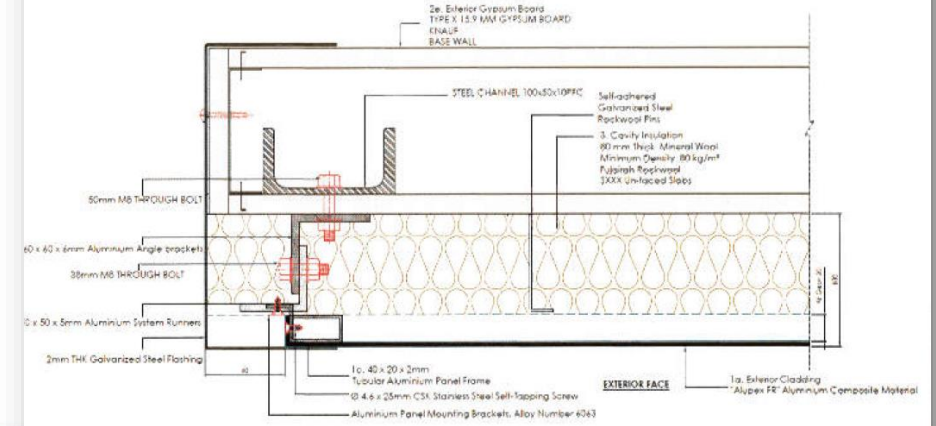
"Alupex FR" non-load-bearing exterior wall cladding window side flashing details
